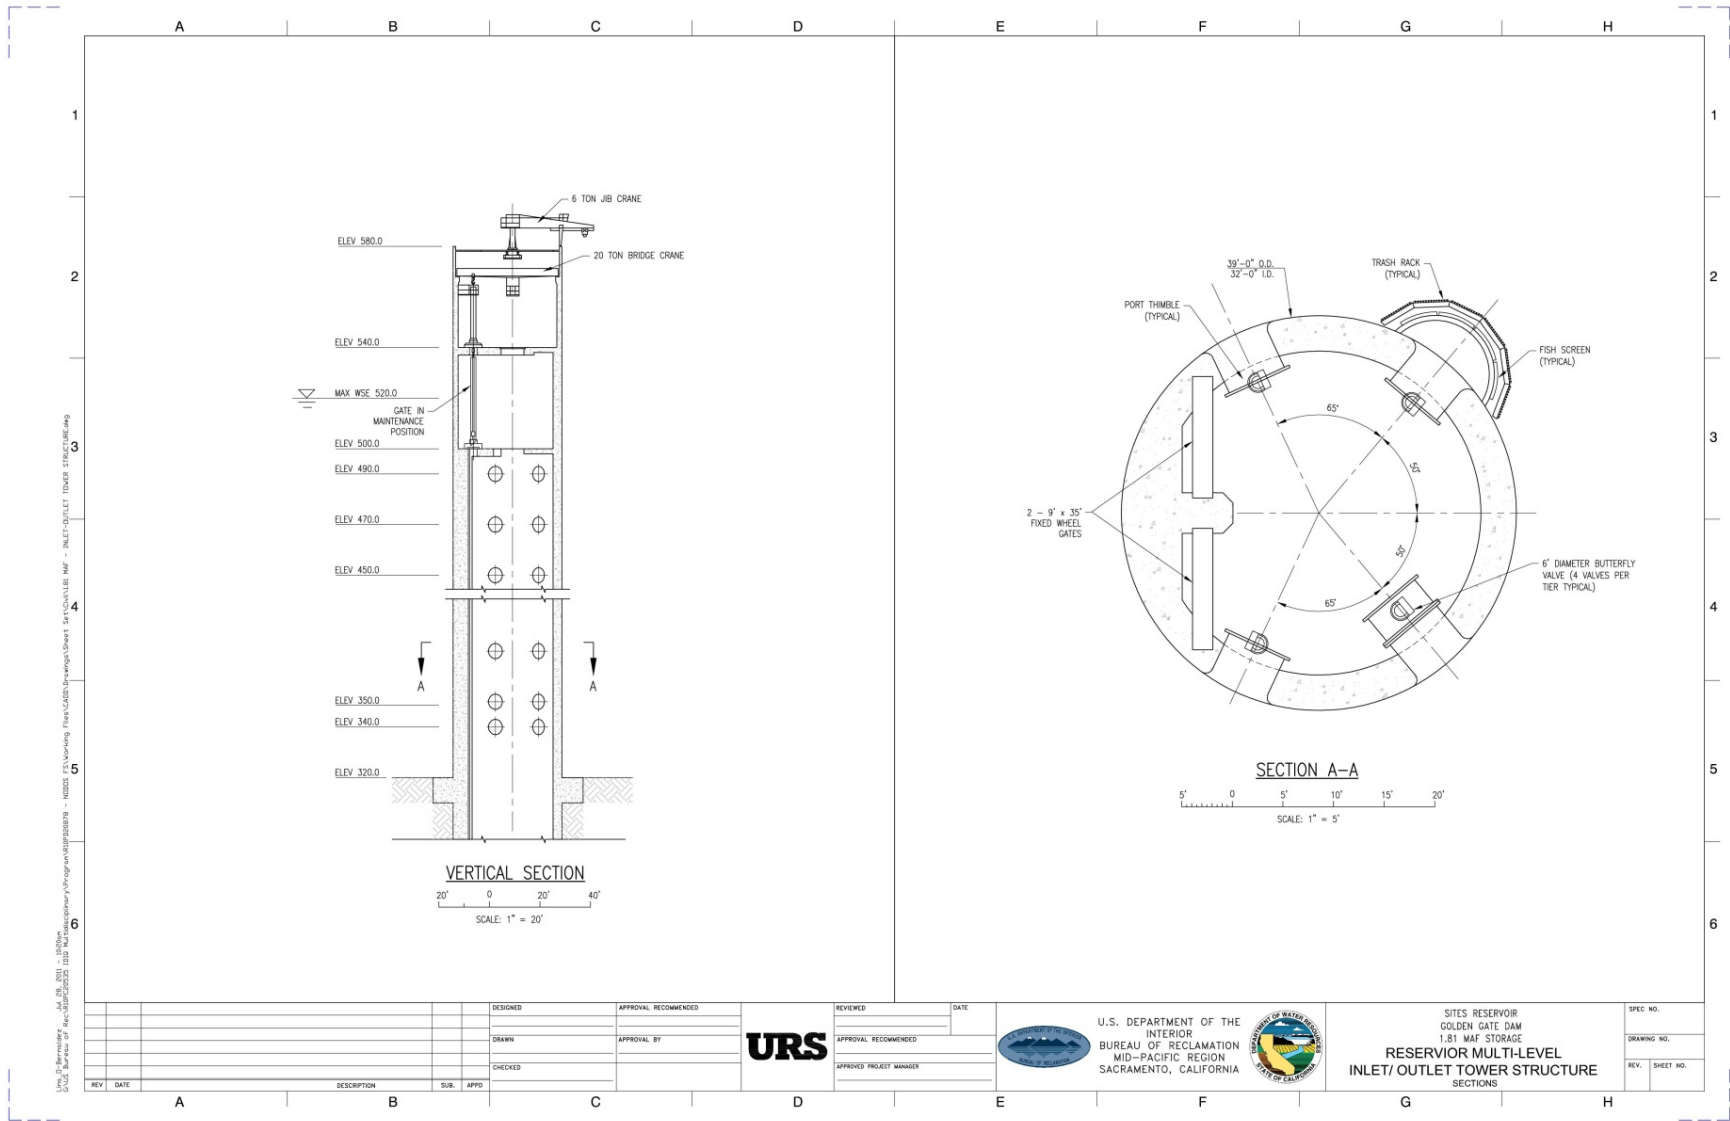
Inlet/Outlet Tower Structure – Typical Sections
